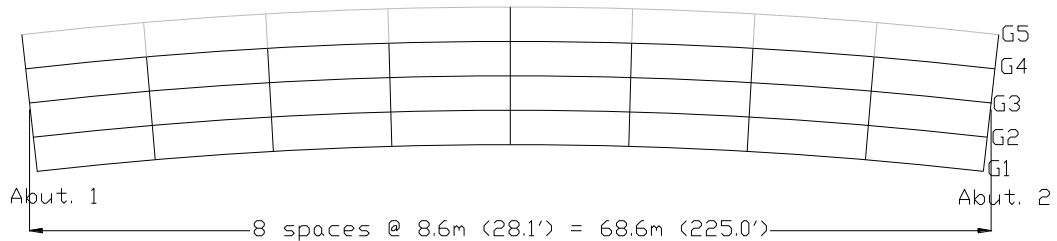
Stage 4 of Construction for Single Girder (Inner Girder Placed First) Erection of Single-Span, 5-Girder, 305-m (1000-ft) Radius Bridge.
